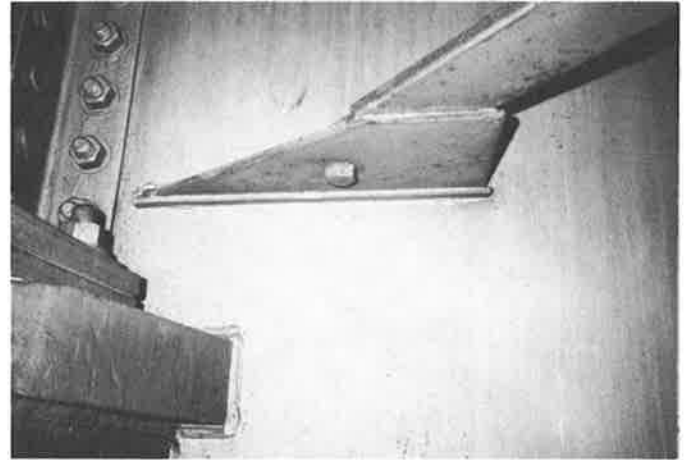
Lower Lateral Bracing Gusset Plate Welded to Cap Web
